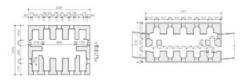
Typology 1-5: Floor Plan of No. 22, 35
